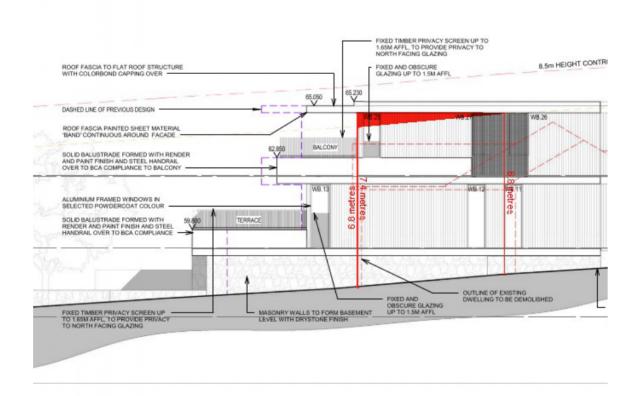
27A Alan western elevation showing area of wall height non-compliance.
